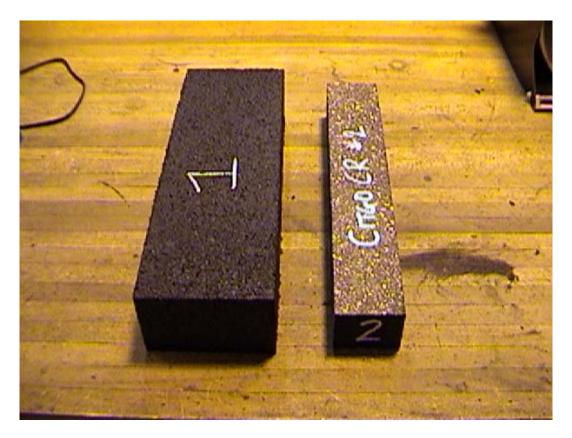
Compacted and Cut Samples for Beam Fatigue Testing
